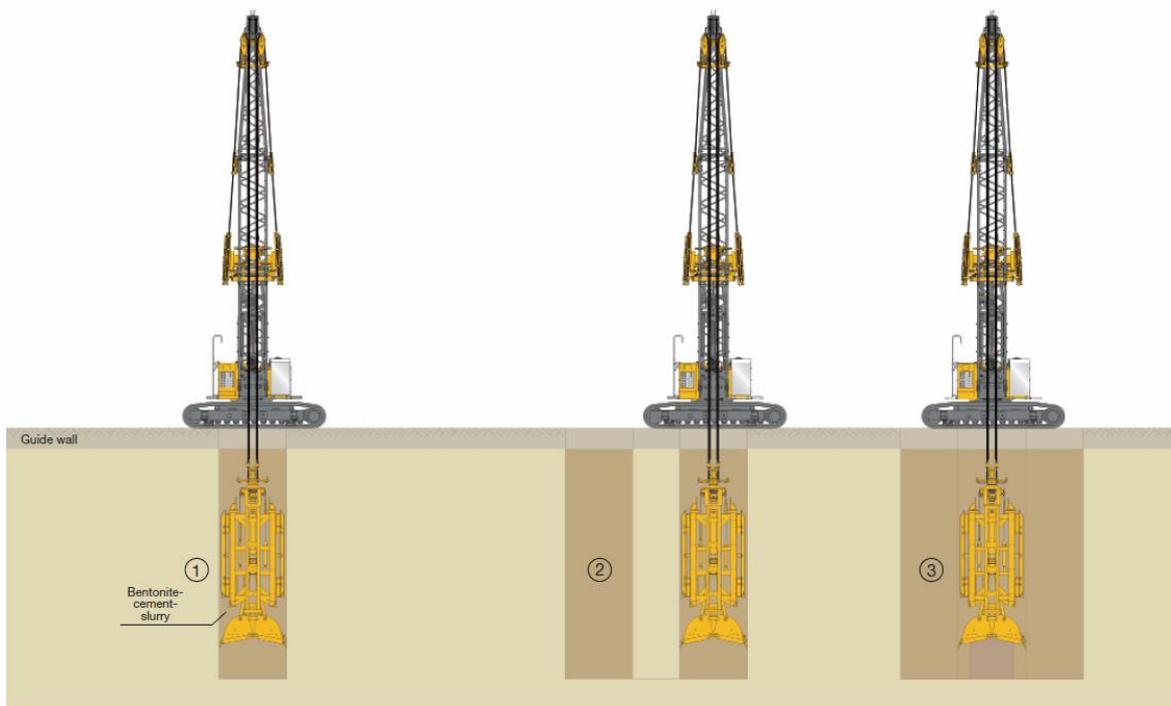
1 phase diaphragm wall construction sequence (*Bauer*)
